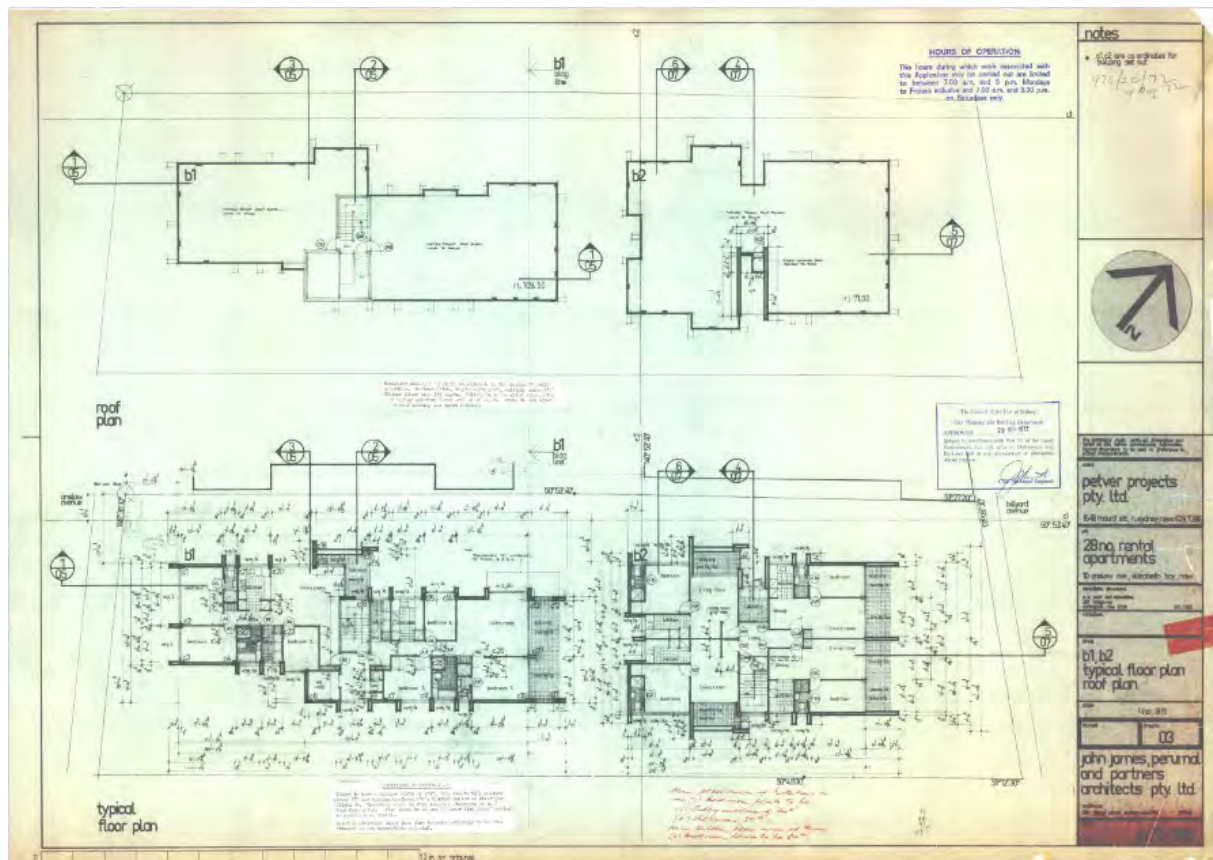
Submitted architectural drawings, Building 1 and 2 typical floor plans, 1972. (Source: City of Sydney Archives, A-00590018)
